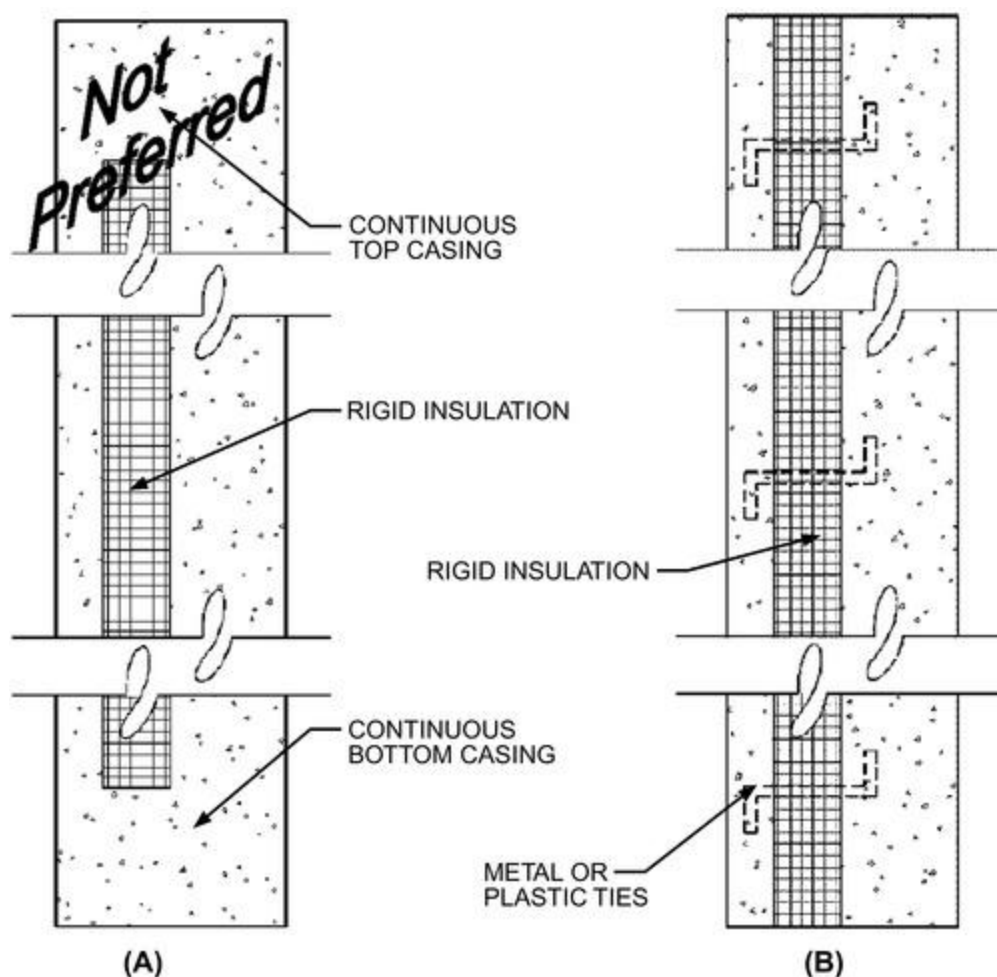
Sandwich Panel with Insulation Encased in Concrete
